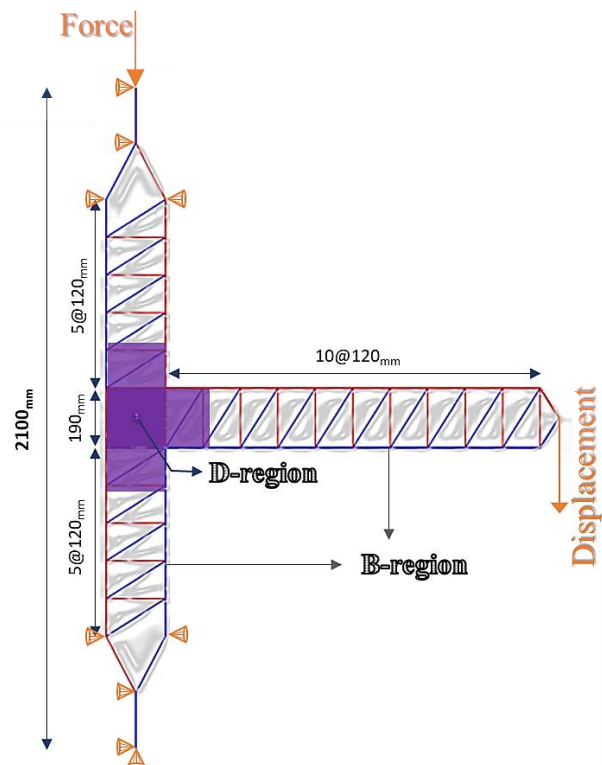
Loading, boundary conditions, and general dimensions of the beam-column joint strut and tie model
